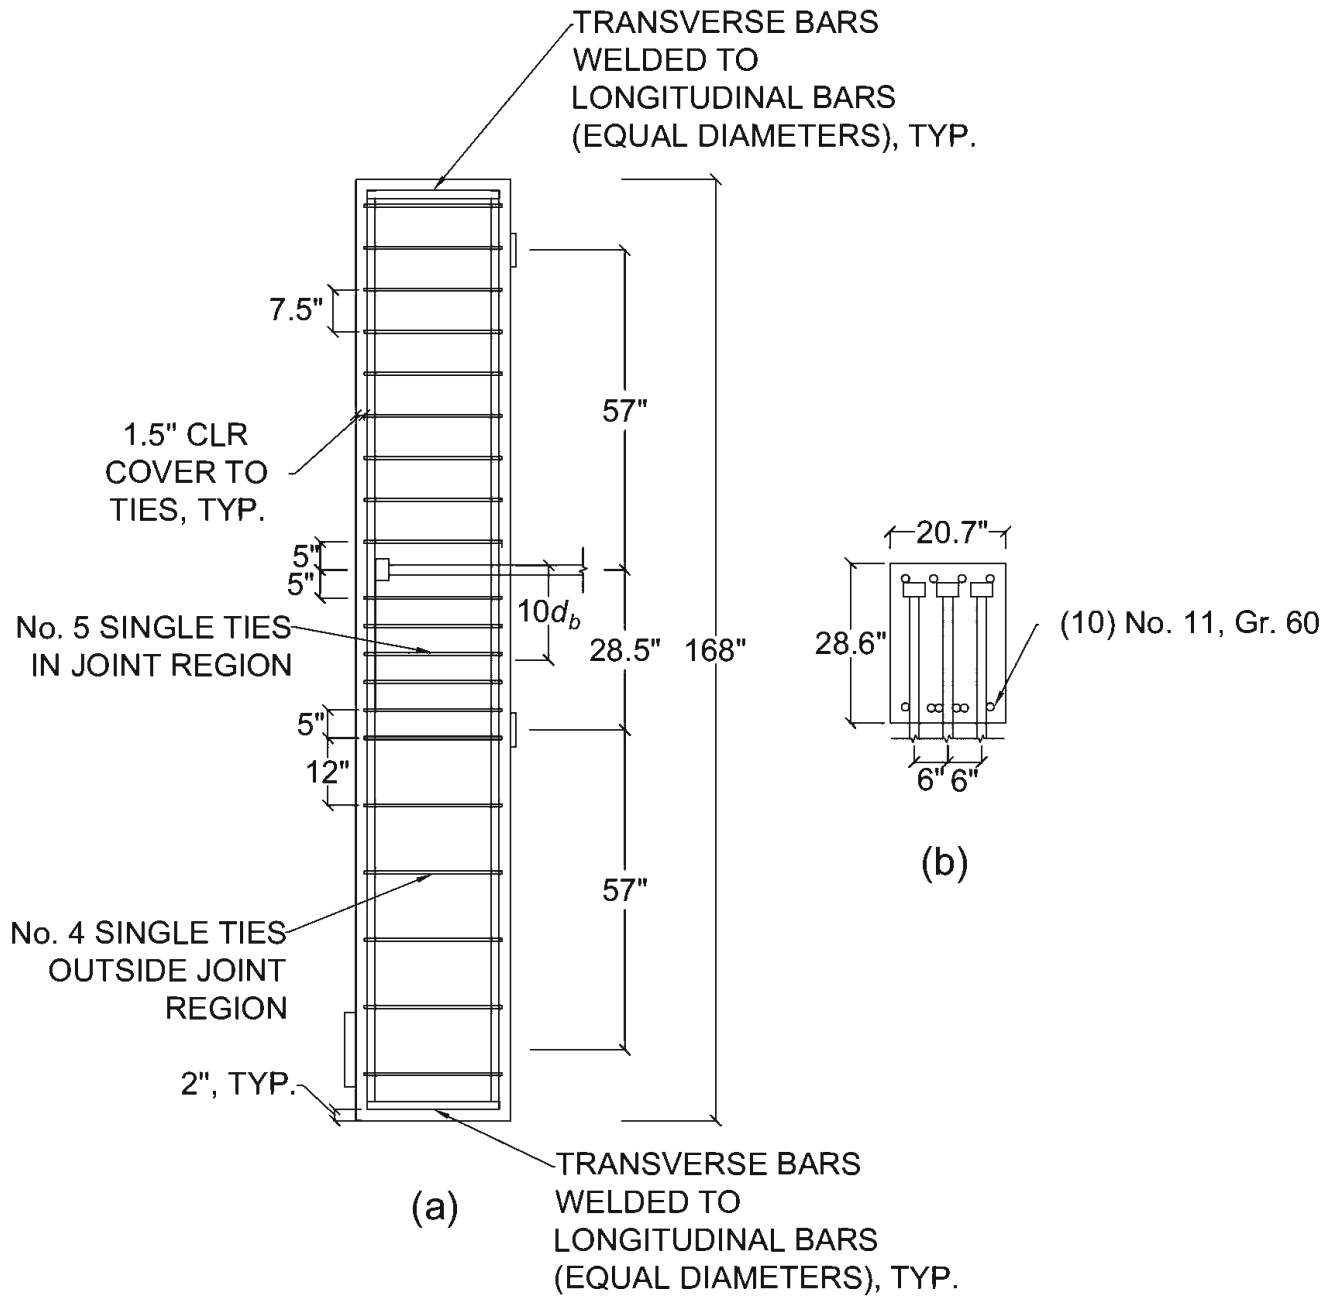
Details of reinforcement layout for No. 14 headed bar specimen 14-6: (a) elevation, (b) cross-section
